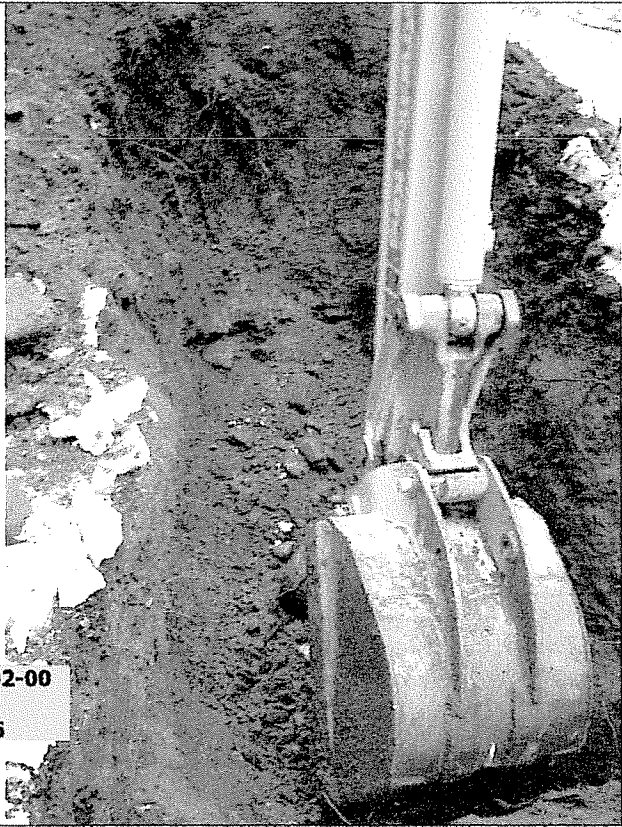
View of excavated material from a depth of 5.5 to 7-feet below grade in Test Pit 1.
